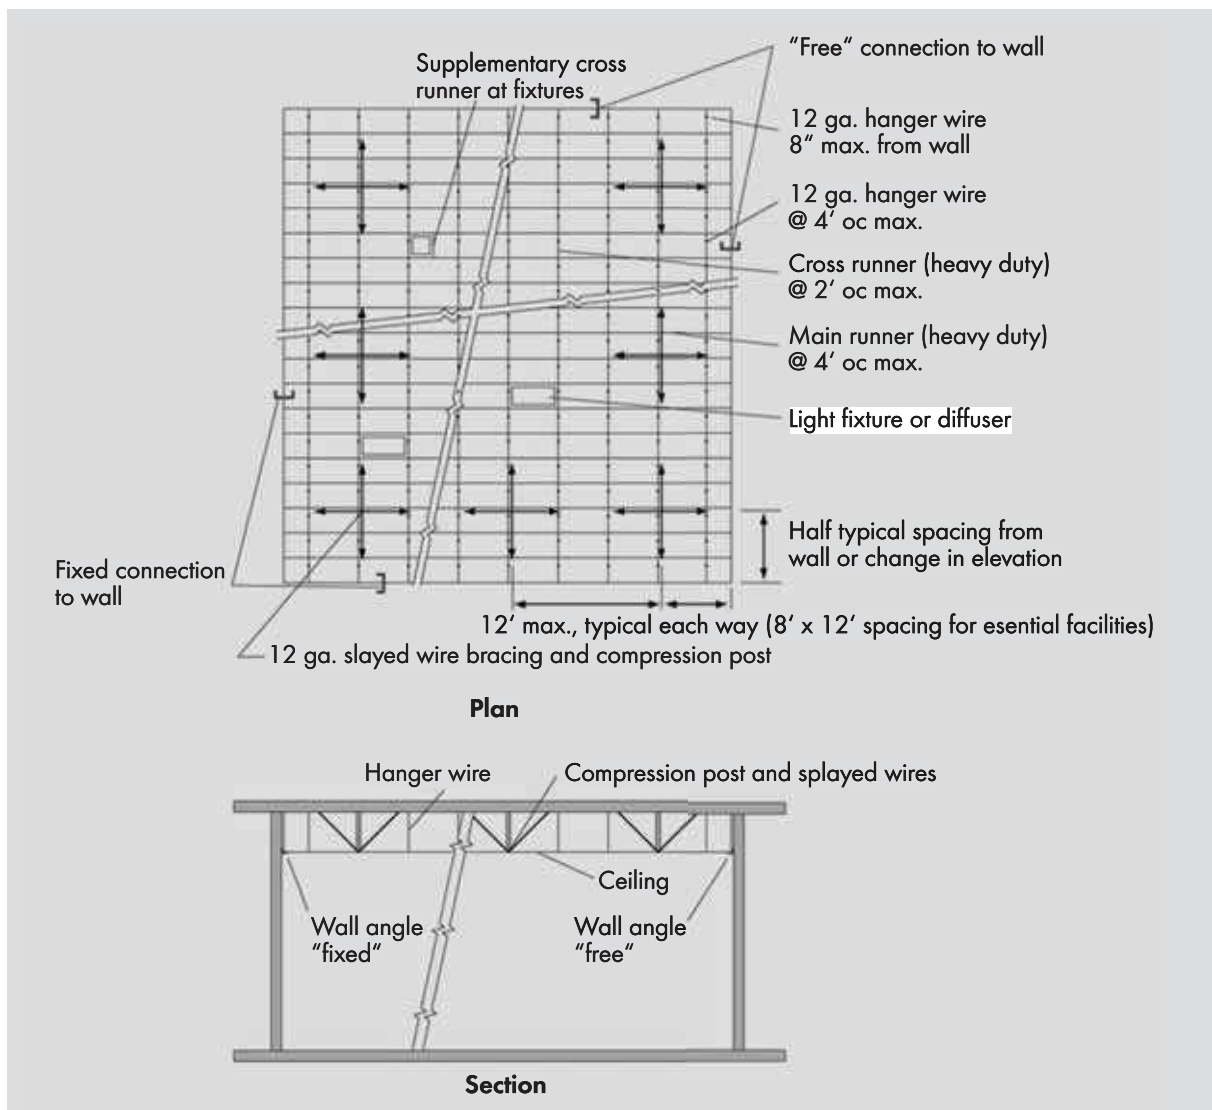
General layout of the seismic bracings for suspended acoustic lay-in tile ceilings /FEMA E-74 (2011)/
